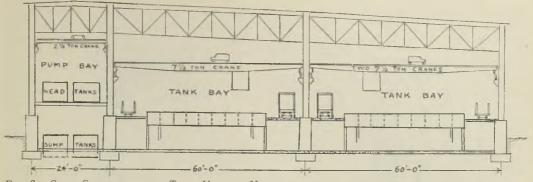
Cross-Section of the Tank House : Note position of floor and of portable cathodewashing machines.
